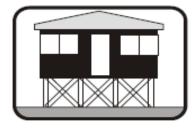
Raised structures: on piers, posts or columns and pilings (Pinellas County Building Department, 2004).
